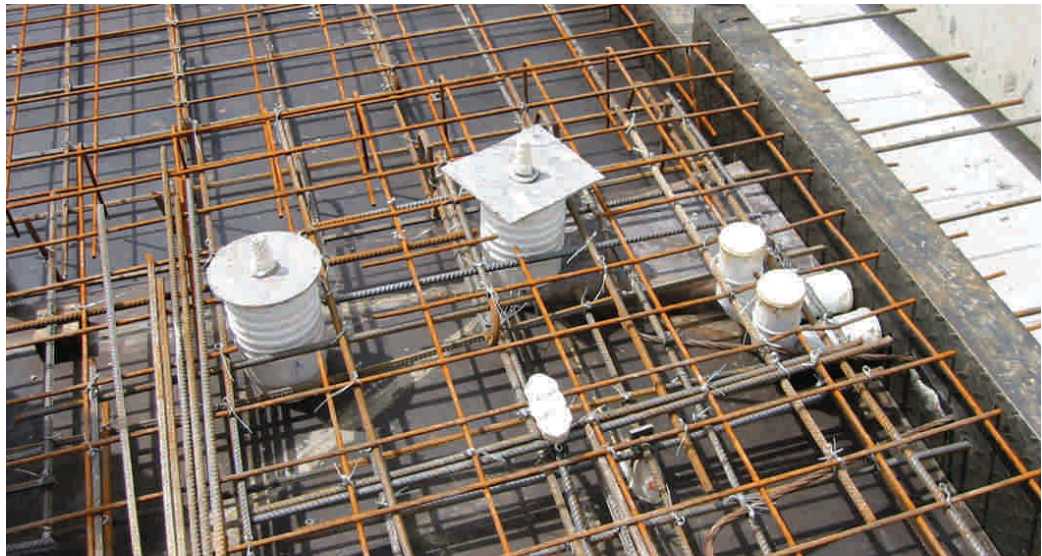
Services can be embedded within the floor slab and extended up and above floor level for connection
